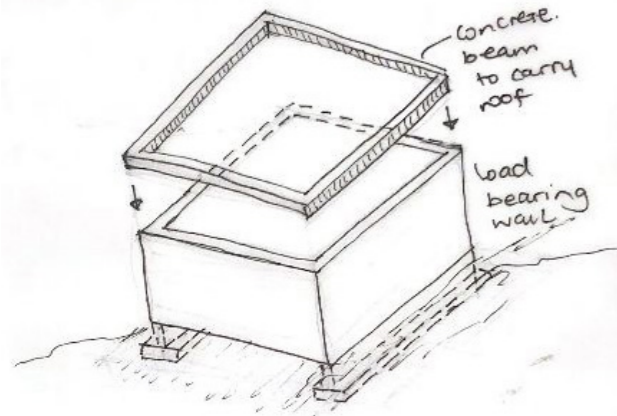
Sketch of load bearing walls and ring beam structure (Author 2021)
